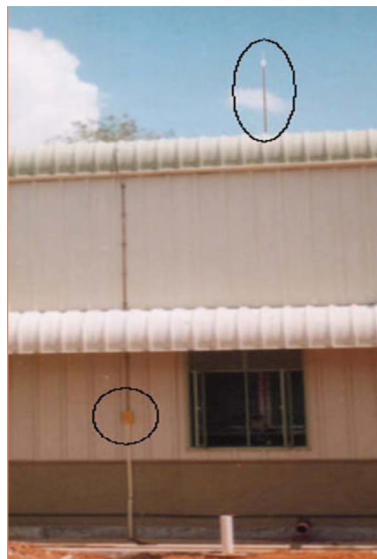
An all-metal structure (supporting struts, roof, and facades) installed with ESE air terminations and bare copper down conductors in contact with the building material. The air termination and aluminum test joint box are shown highlighted with black circles.
